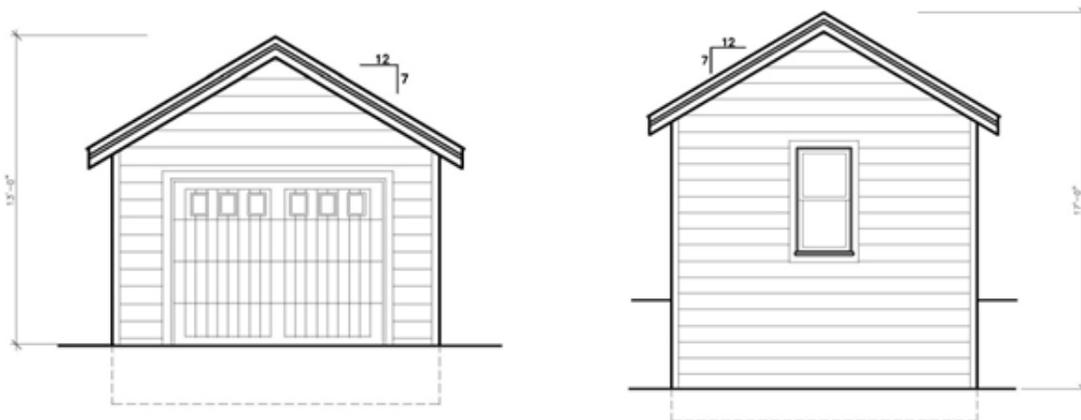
Proposed west elevation (left, facing 6th St.) and east elevation (right, interior lot)
